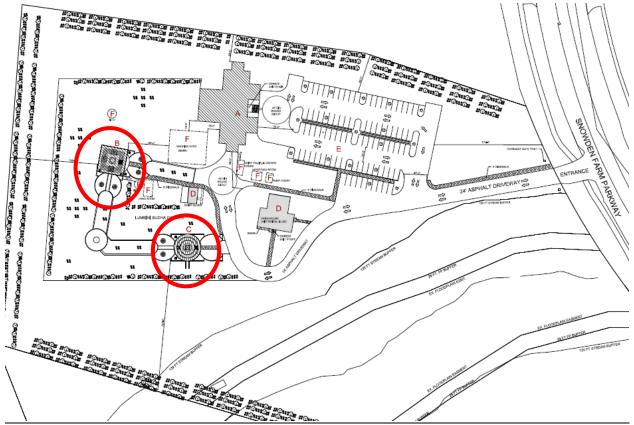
June 2021 concept site plan with statues labeled as 'B' and 'C.'
